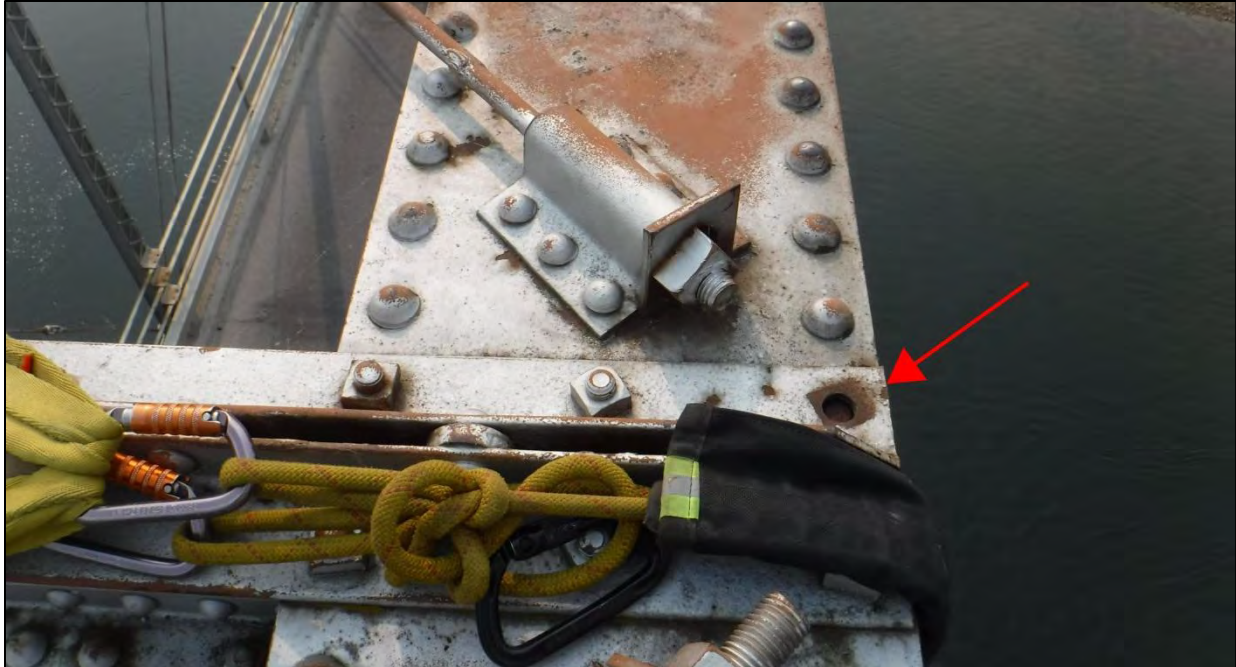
Span 1, South Truss, Top Chord at U4: one bolt was sheared off on the horizontal brace to top chord connection plate
